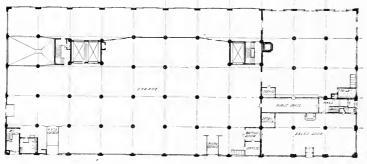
First Floor Plan, Ford Motor Company, Omaha, Neb.
